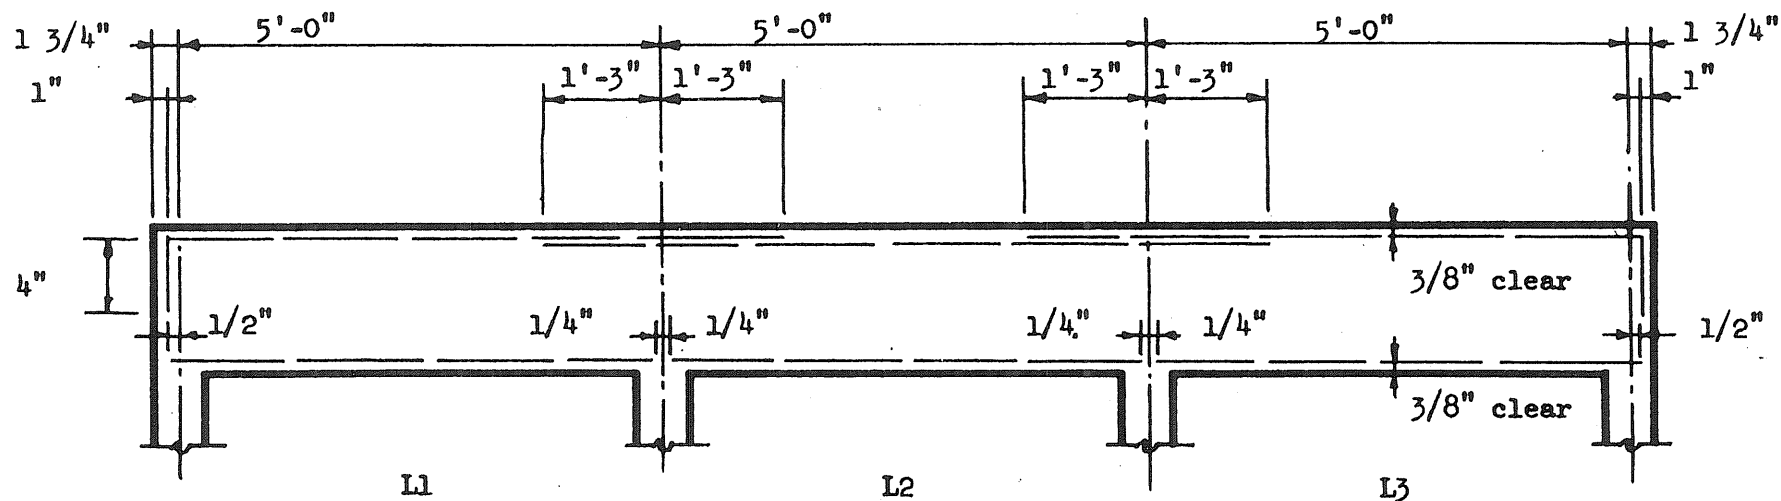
LAYOUT OF TEST STRUCTURE
